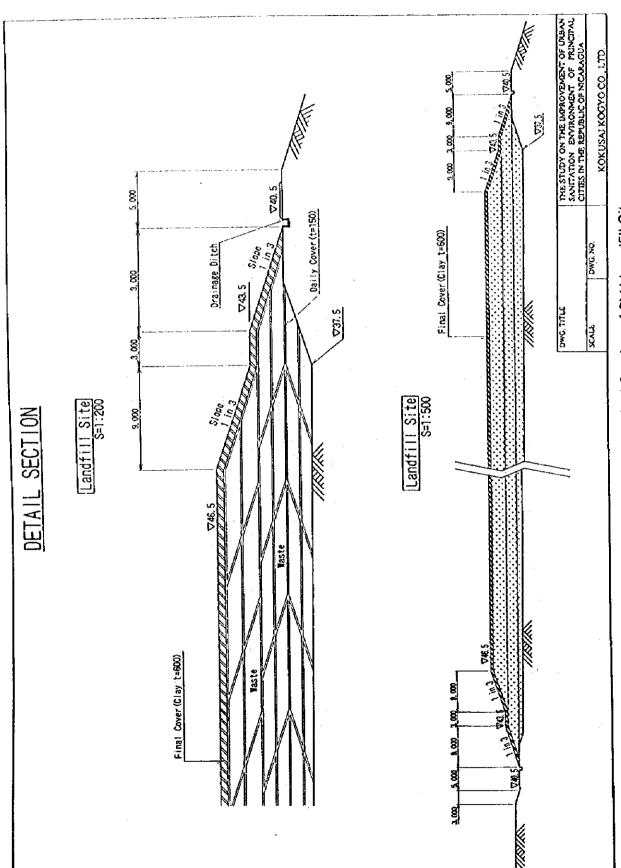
Detail and Longitudinal Section of SVJ Landfill Site
